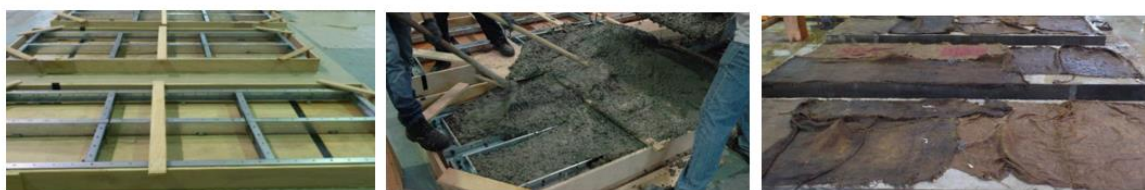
Foamed concrete slab with cold-formed steel as reinforcement [80]. Reprinted with permission from [80].
